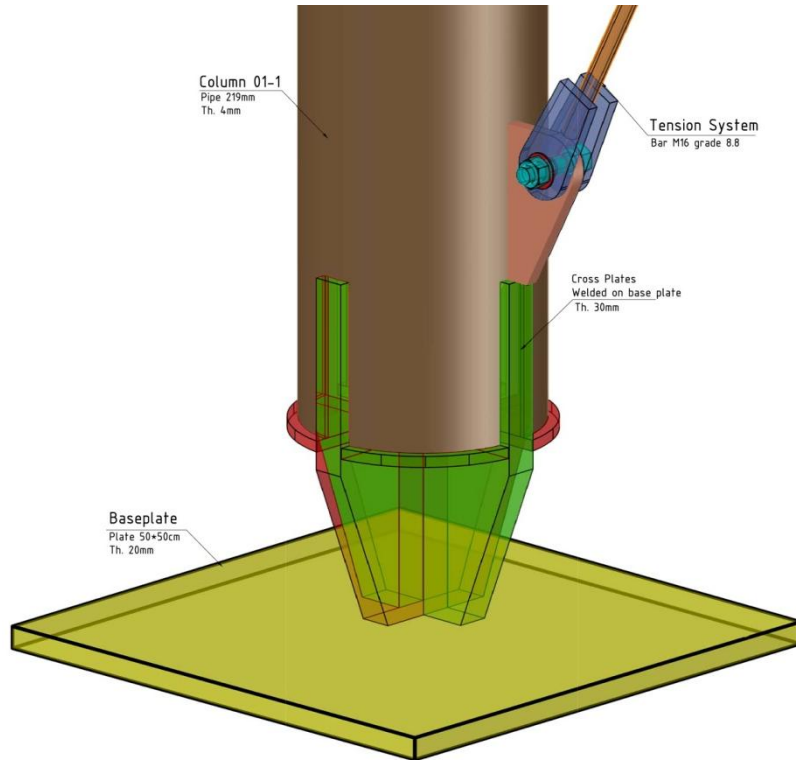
there is a cross plate for columns connection to the base plates ,that is welded inside the pipe grooves and it must be welded on base plates in bottom.
